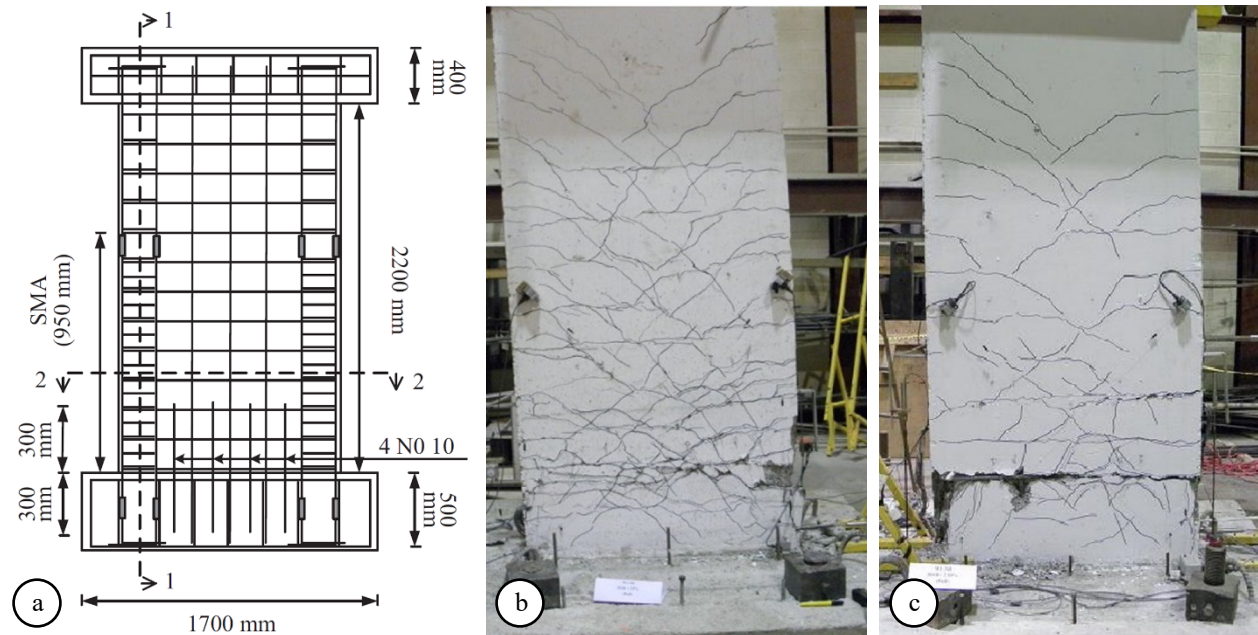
Slender shear walls: (a) reinforcement details; and damage patterns at 3% drift for (b) steel-reinforced wall; and (c) Nitinol-reinforced wall (Abdulridha and Palermo, 2017).
